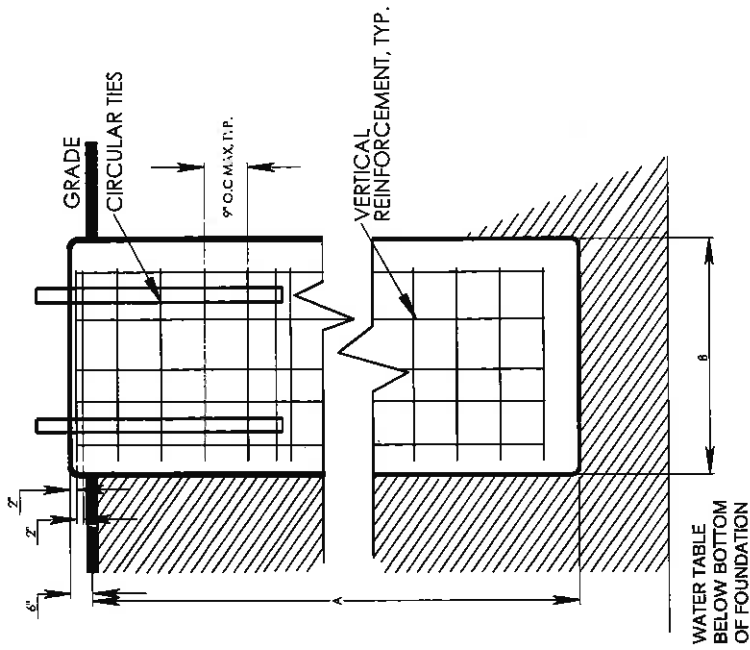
Technical drawing for Pier Foundation 33 ft. Tower
